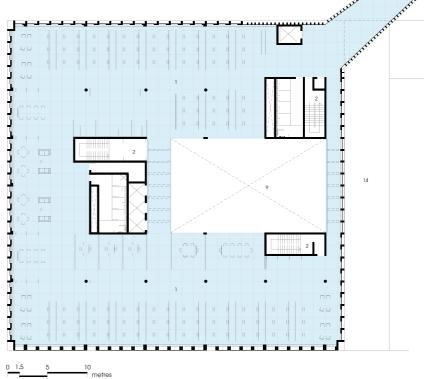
NEW COUNCIL BUILDING FURNITURE STRATEGY TYPICAL LAYOUT ILLUSTRATING OPTIMIZED ZONING: FID SPACE
